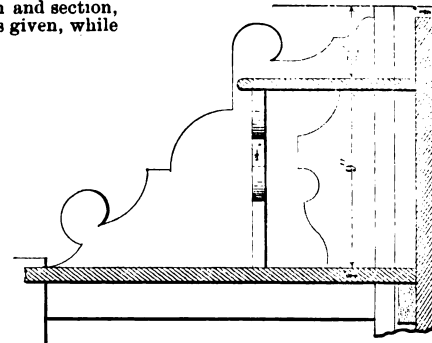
Section Through C D of Fig. 2.—Scale, 1½ Inches to the Foot.
